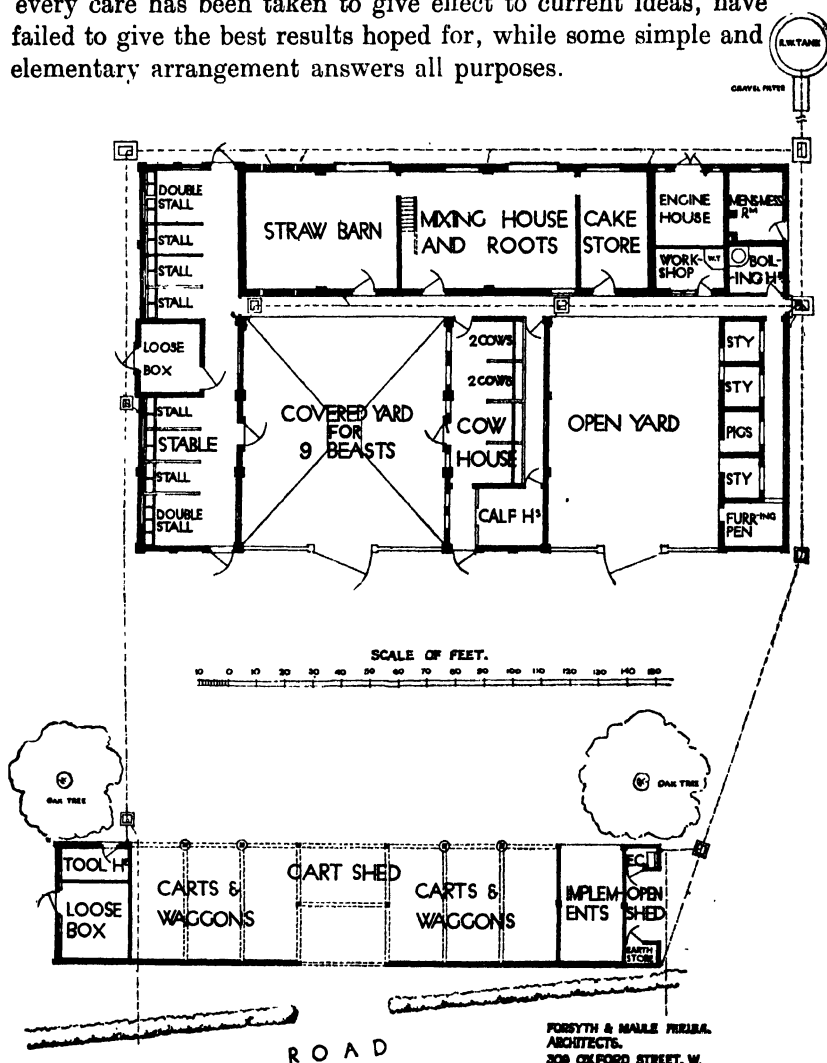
Plan of Farm Buildings, Newtown Farm, Lymington.
